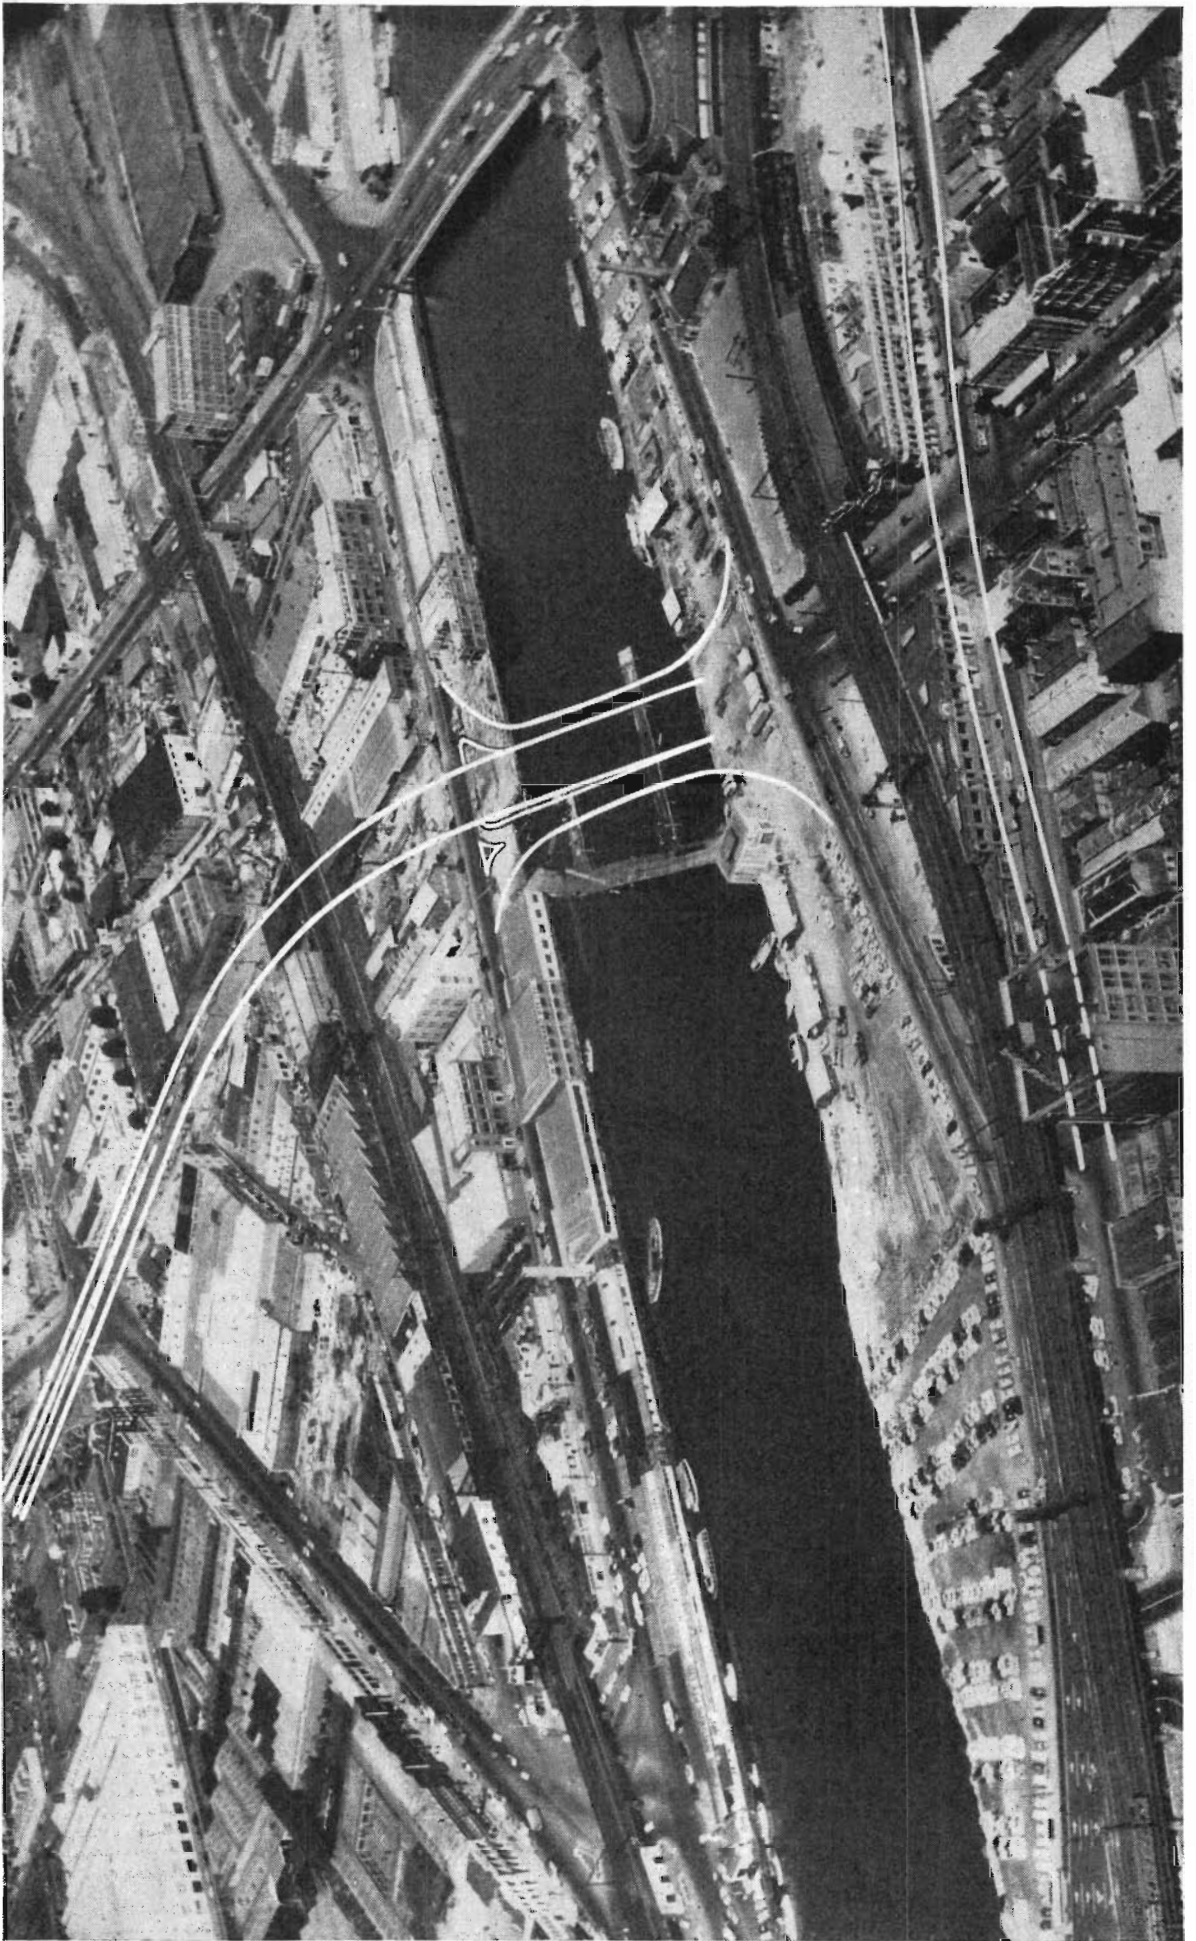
King Street Bridge Site showing temporary bridge across Yarra River. White lines show construction area in Flinders Street (right foreground) and across river to Hanna Street, South Melbourne.
